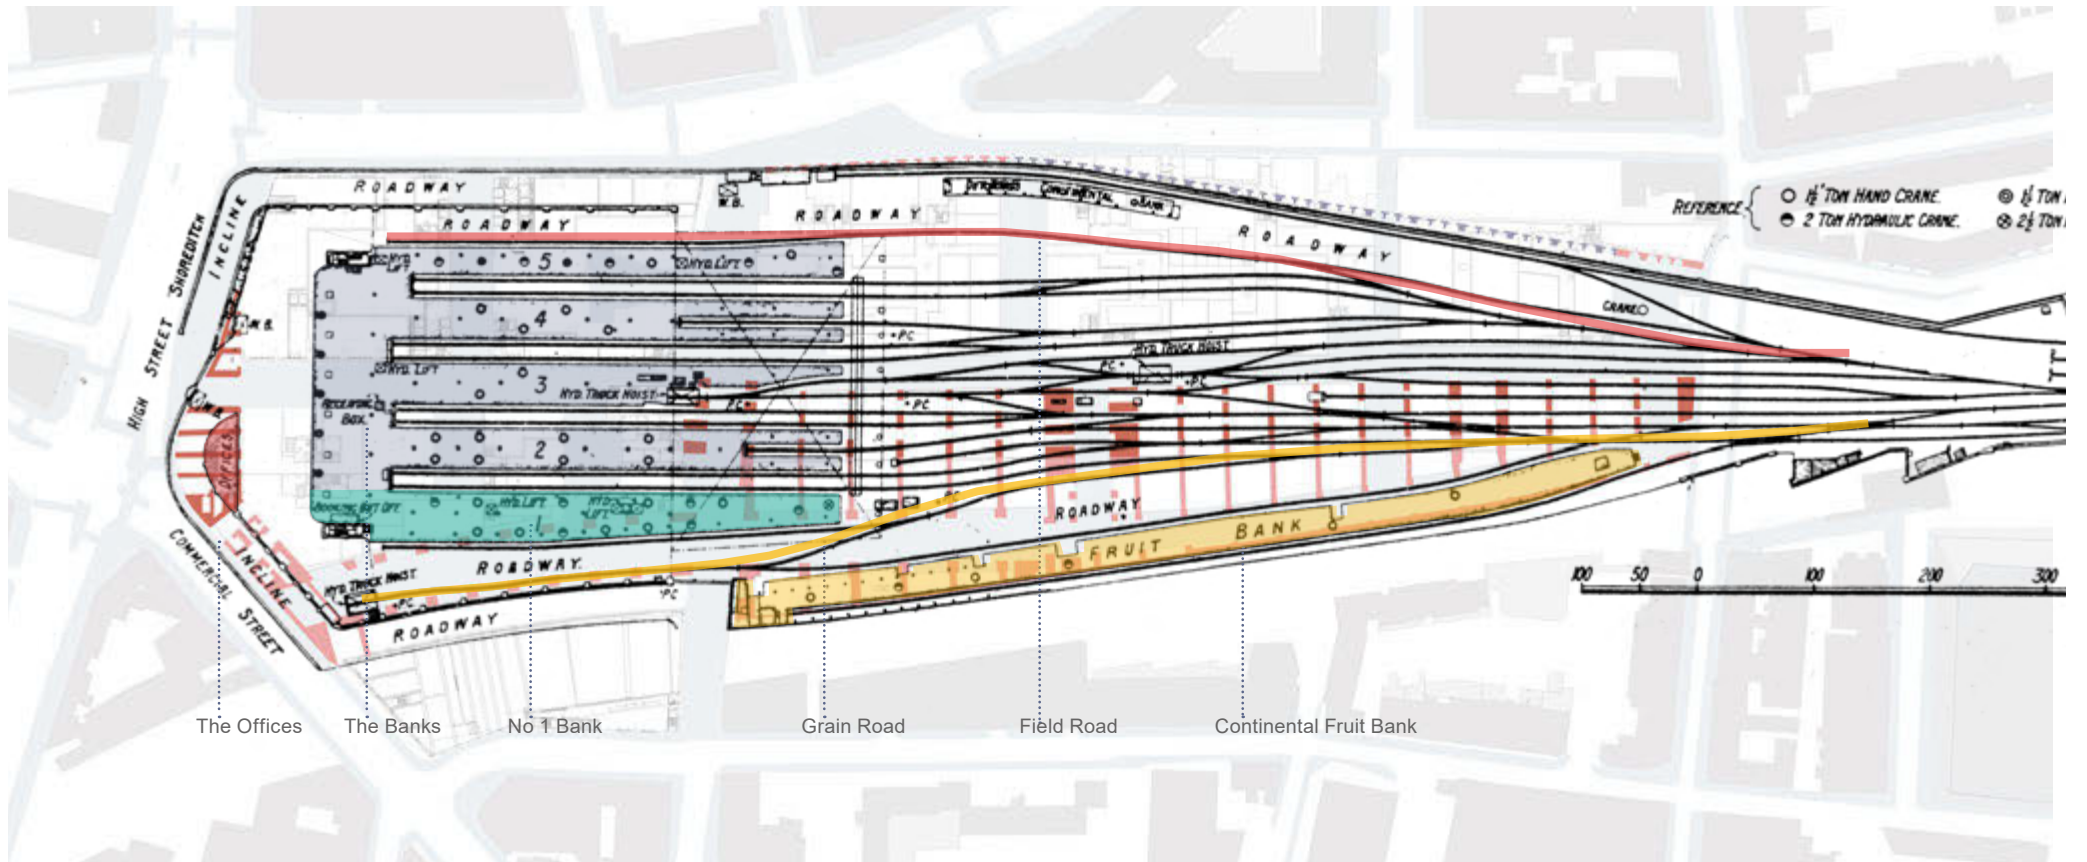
Historic plan: 1890s - Platform level Bishopsgate Goods Yard Station layout
